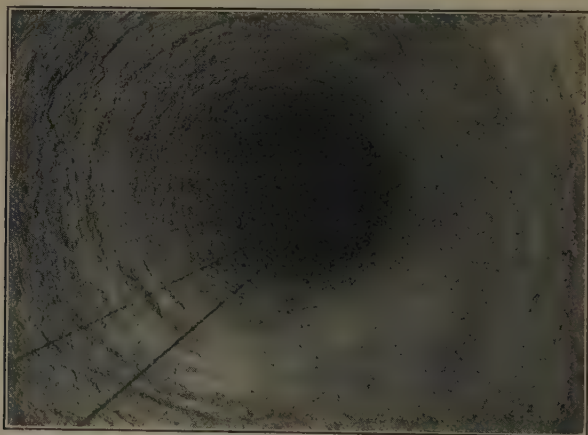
LOOKING DOWNWARD FROM TOP OF CHIMNEY. EXTENT OF SPALLING IS NOTICEABLE.
